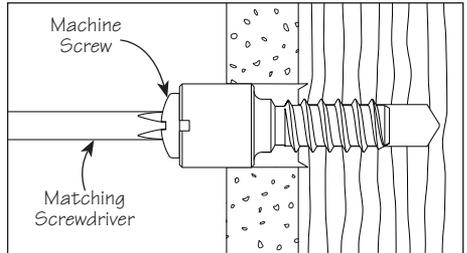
Installing a drywall nut with screwdriver and machine screw.
